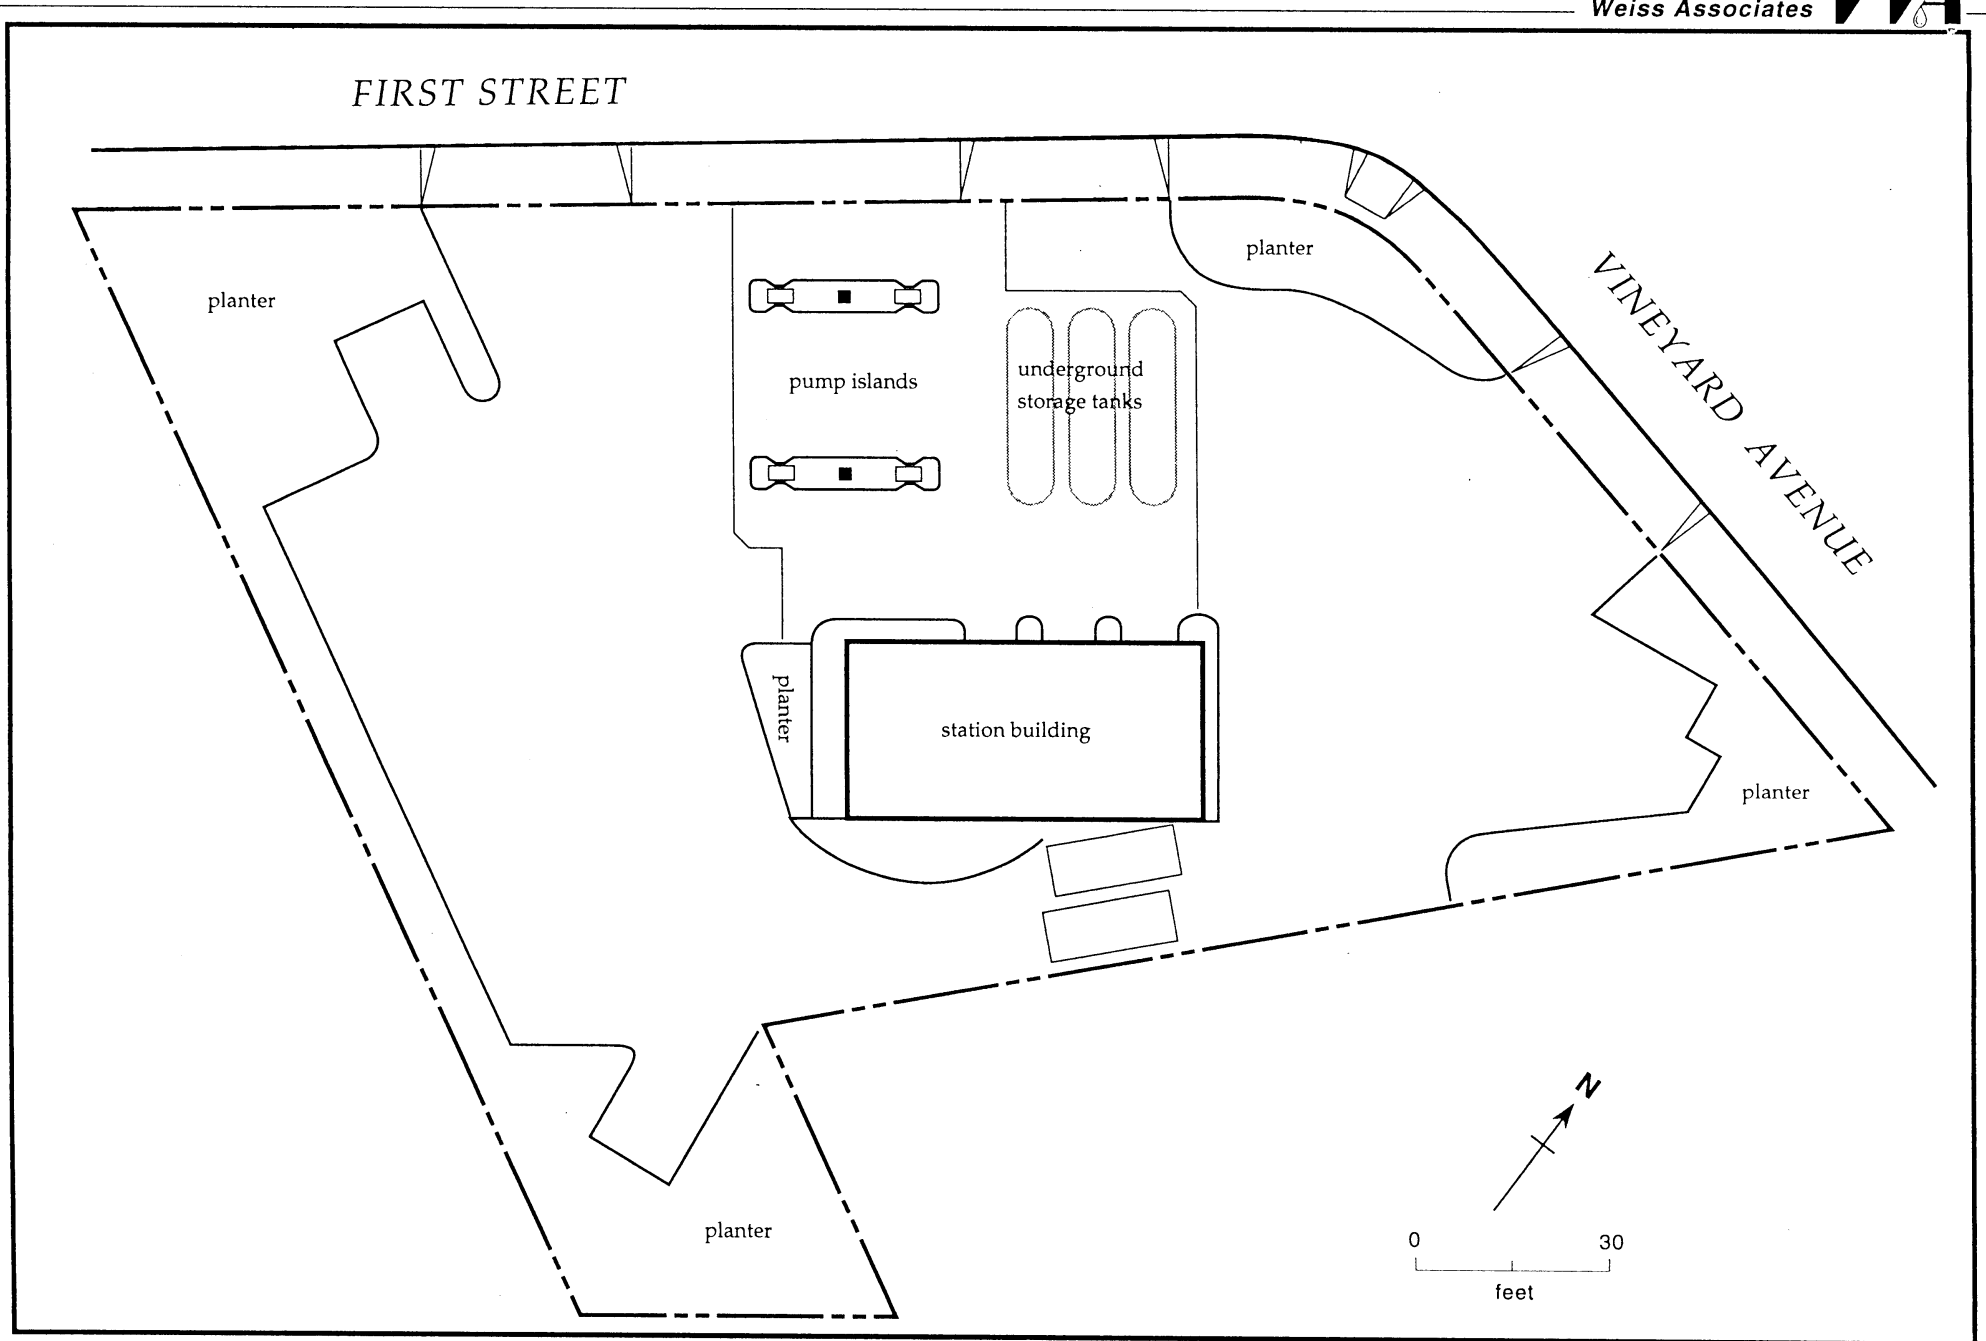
Site Layout - Shell Service Station WIC #204-6138-0303 - 4226 First Street, Pleasanton, California
